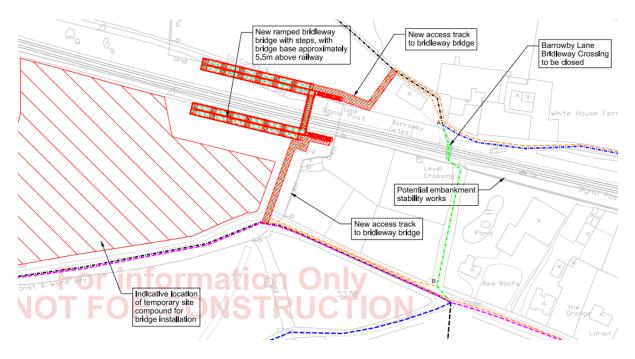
Proposed ramped and stepped bridleway bridge structure, construction compound and existing level crossing locations
